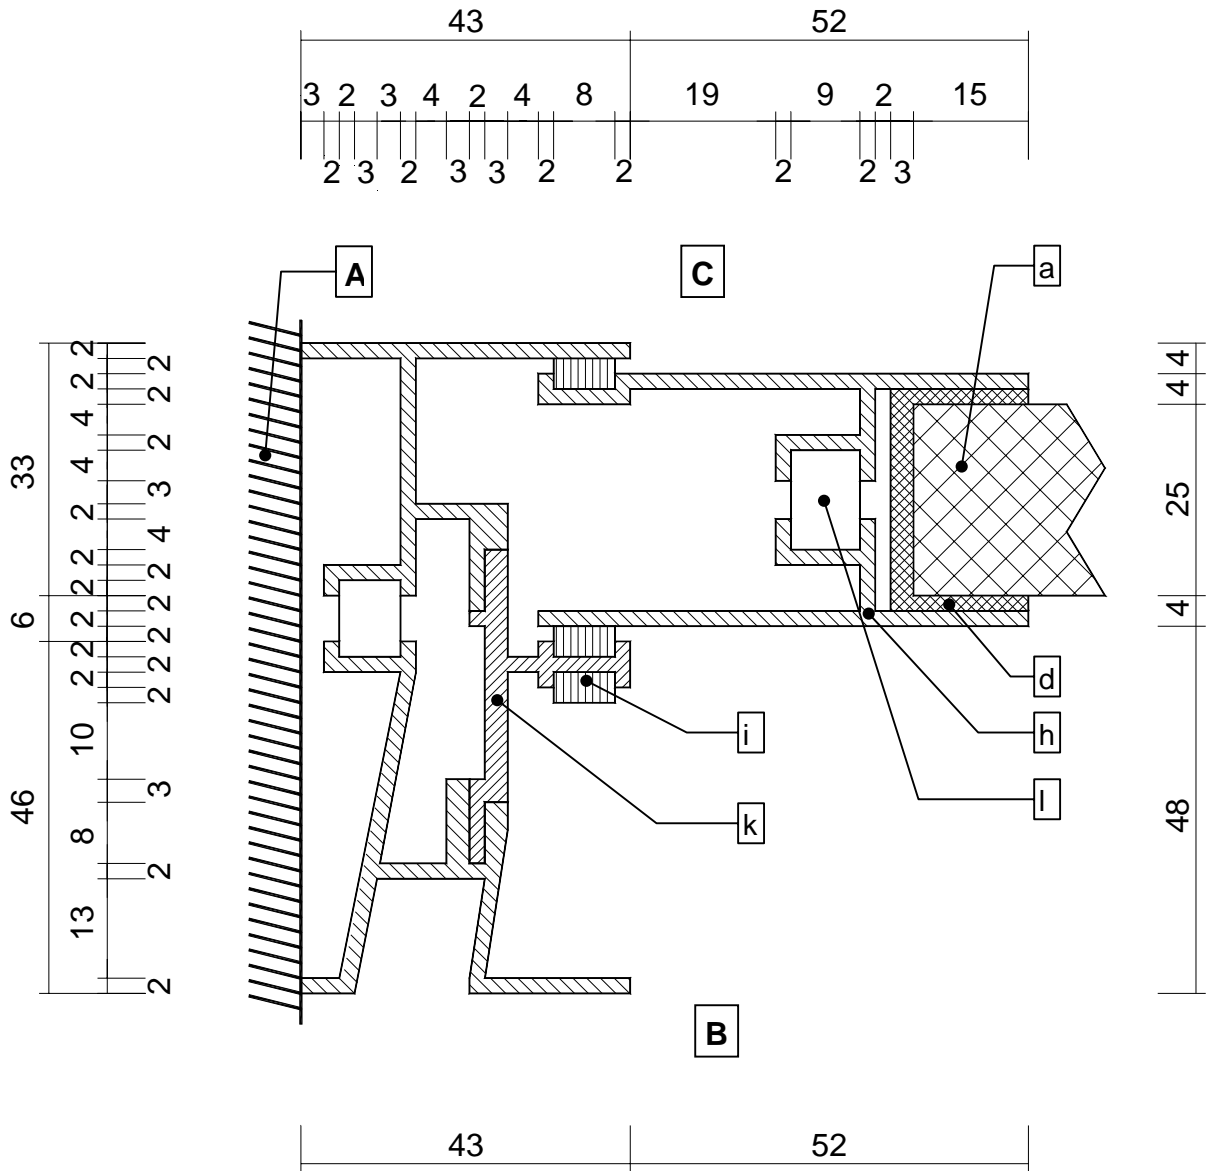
Sliding window frame section and insulation panel ($b_f = 95$ mm)
